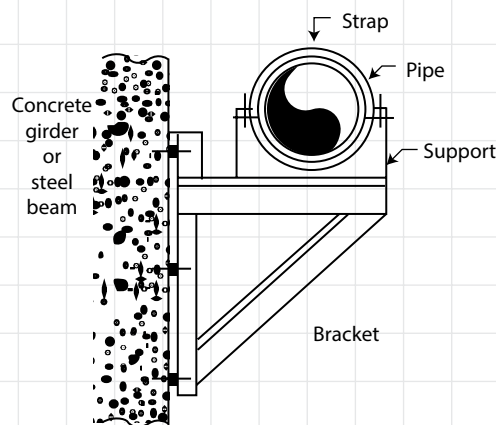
DI Pipe Support on Steel Bracket
